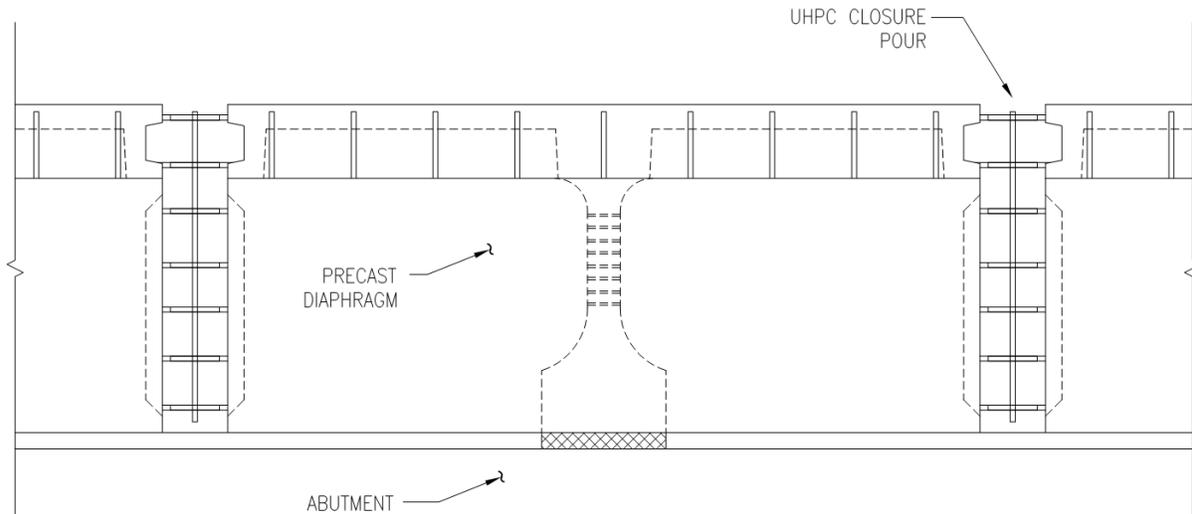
Elevation of Proposed Precast End Diaphragms with Vertical Closure Joints
